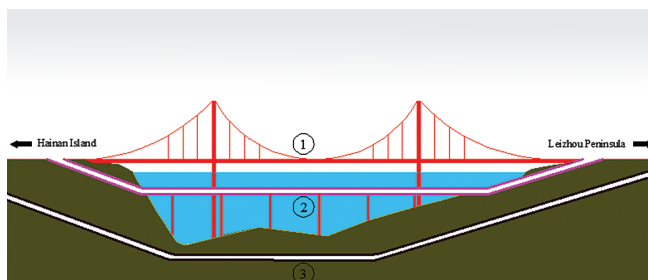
Alternatives of solution: 1) Suspension bridge; 2) Submerged Floating Tunnel; 3) Submarine tunnel
